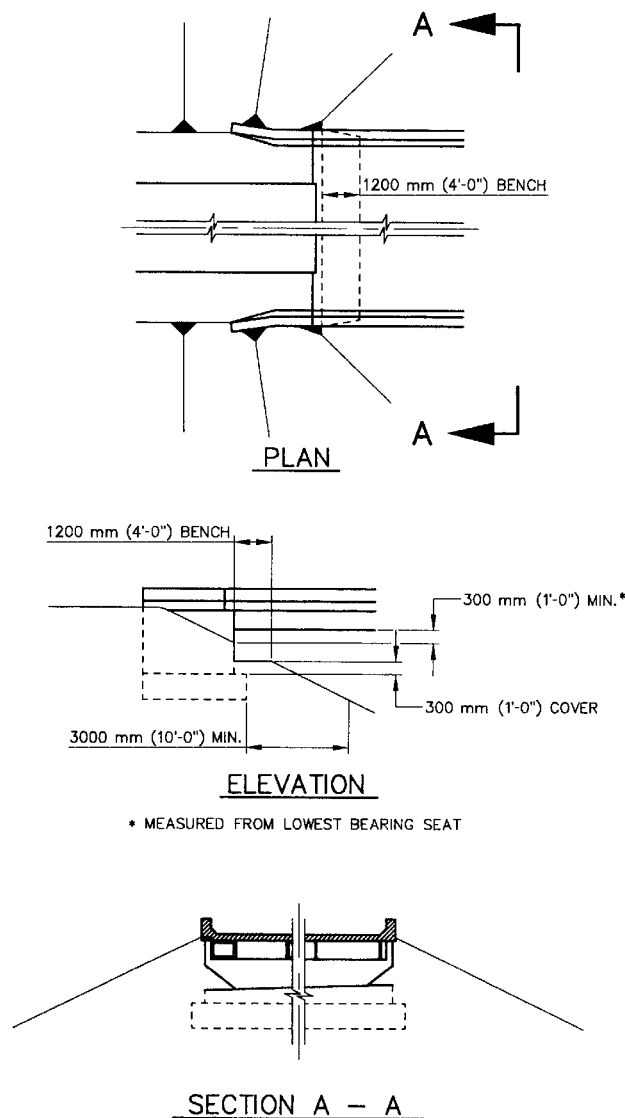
P-1 - Recommended Details for Stub Abutments
